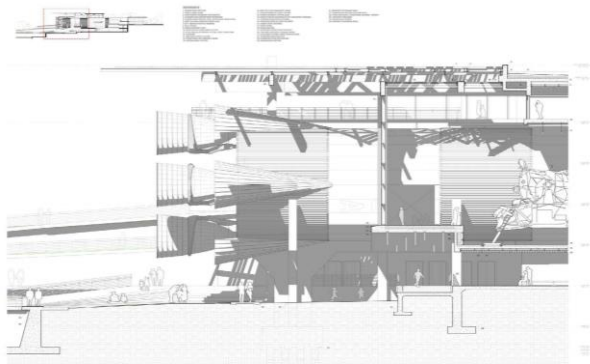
Large Scale Spatial/Construction Section, Grad 2
